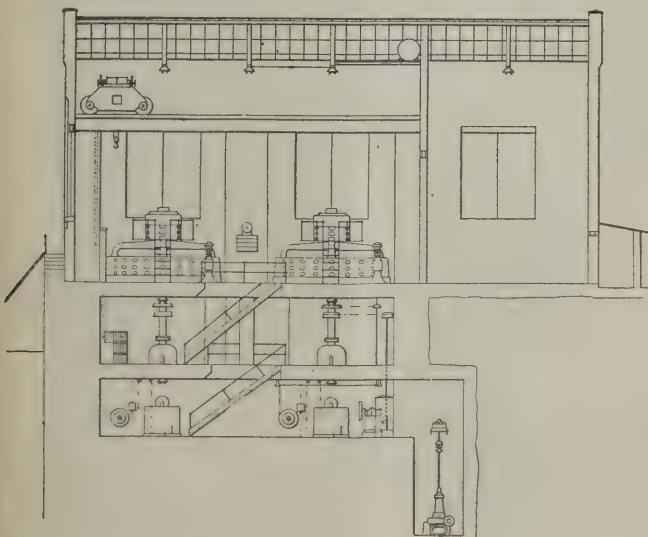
SECTION THROUGH POWER HOUSE, MARSHALL PLANT.
